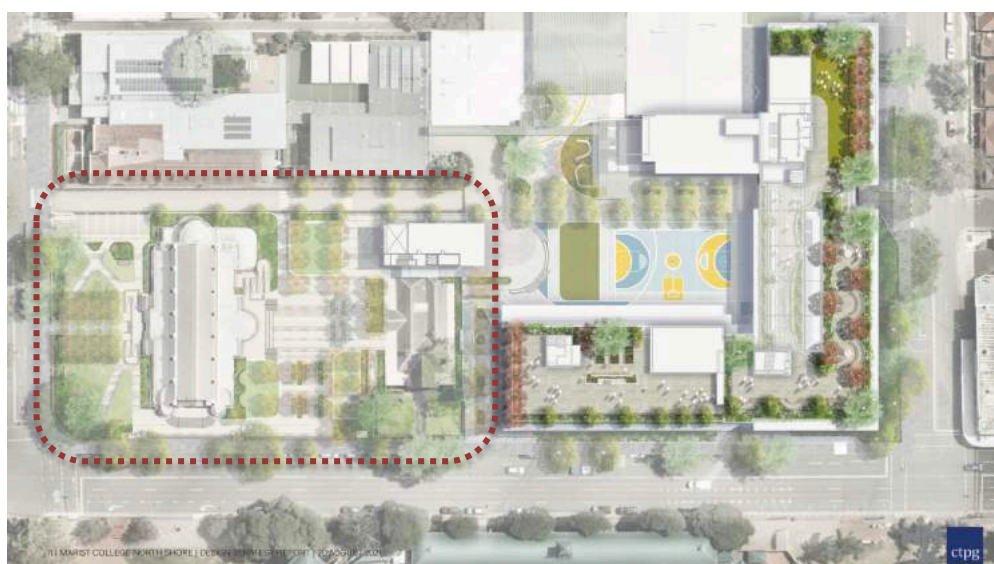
Proposed site plan. Proposed landscape piazza and open space outlined. WMK Architects, August 021.
